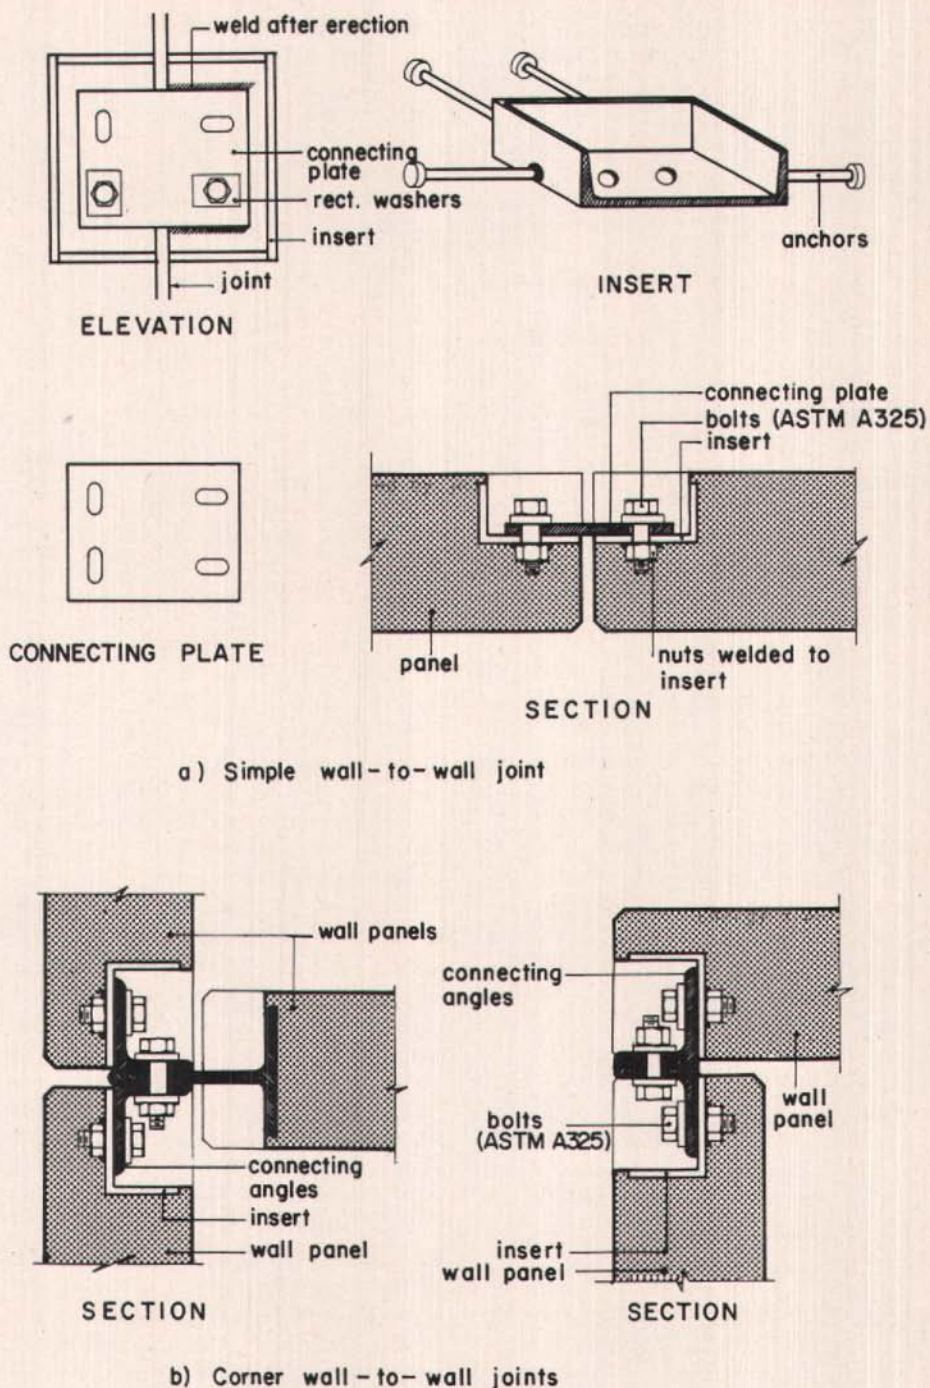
Typical details of Limited Slip Bolted (LSB) joints. Simple wall-to-wall joint (top); corner wall-to-wall joints (bottom).
